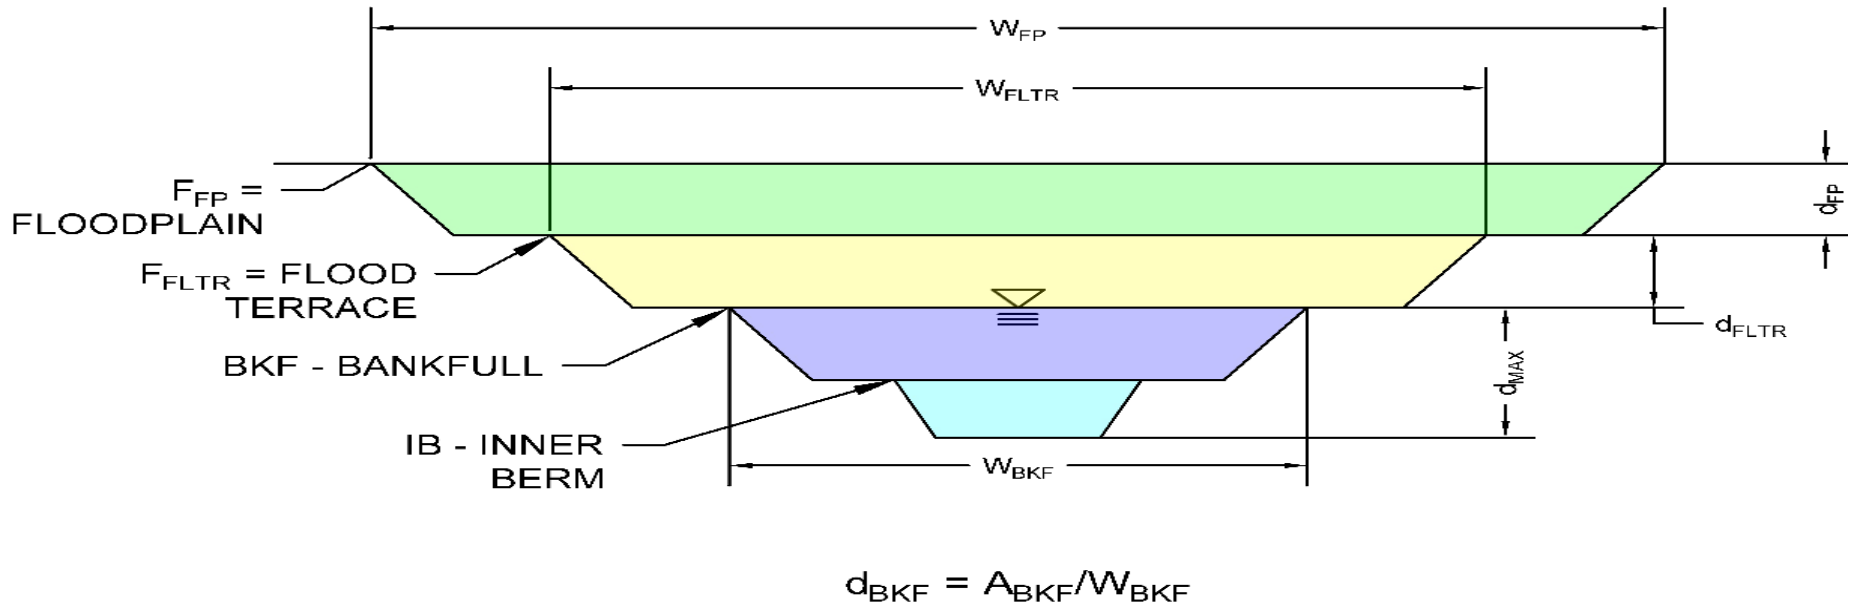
Typical riffle (tangent section) channel cross-section and channel acronyms.
